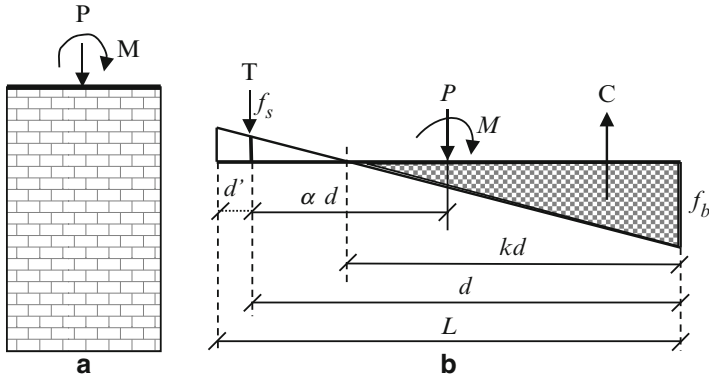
Wall under axial load and in-plane moment (a) Elevation, (b) Stress diagram
